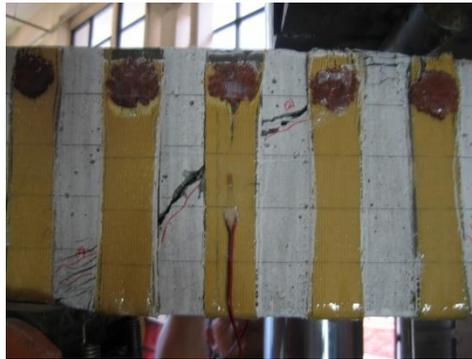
Diagonal crack crossing the FRP stirrups
